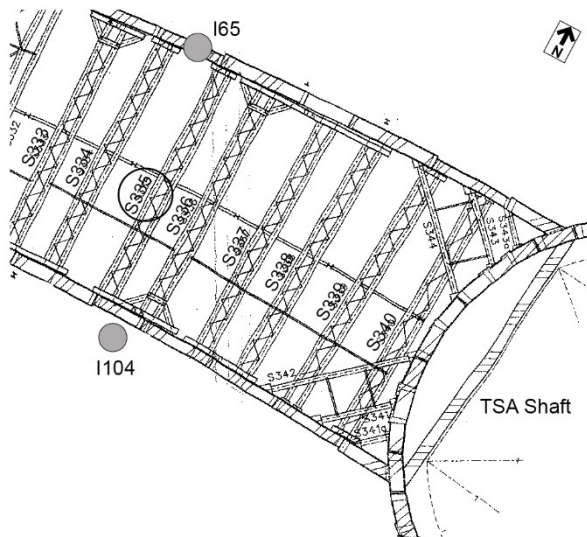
Strutting plan at the Nicoll Highway excavation.
